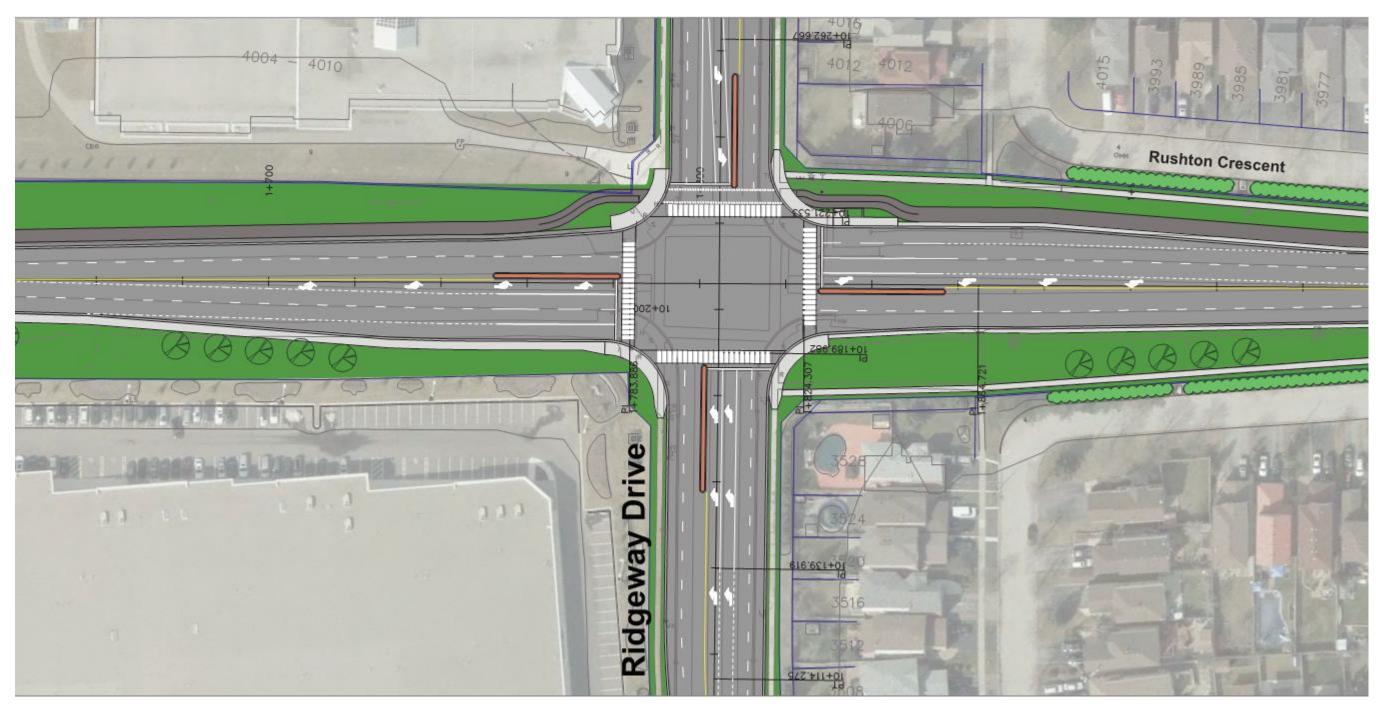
Alternative Design Concept #4 - Widen Burnhamthorpe Road West to 4 Lanes with Intersection Improvements at Ridgeway Drive
